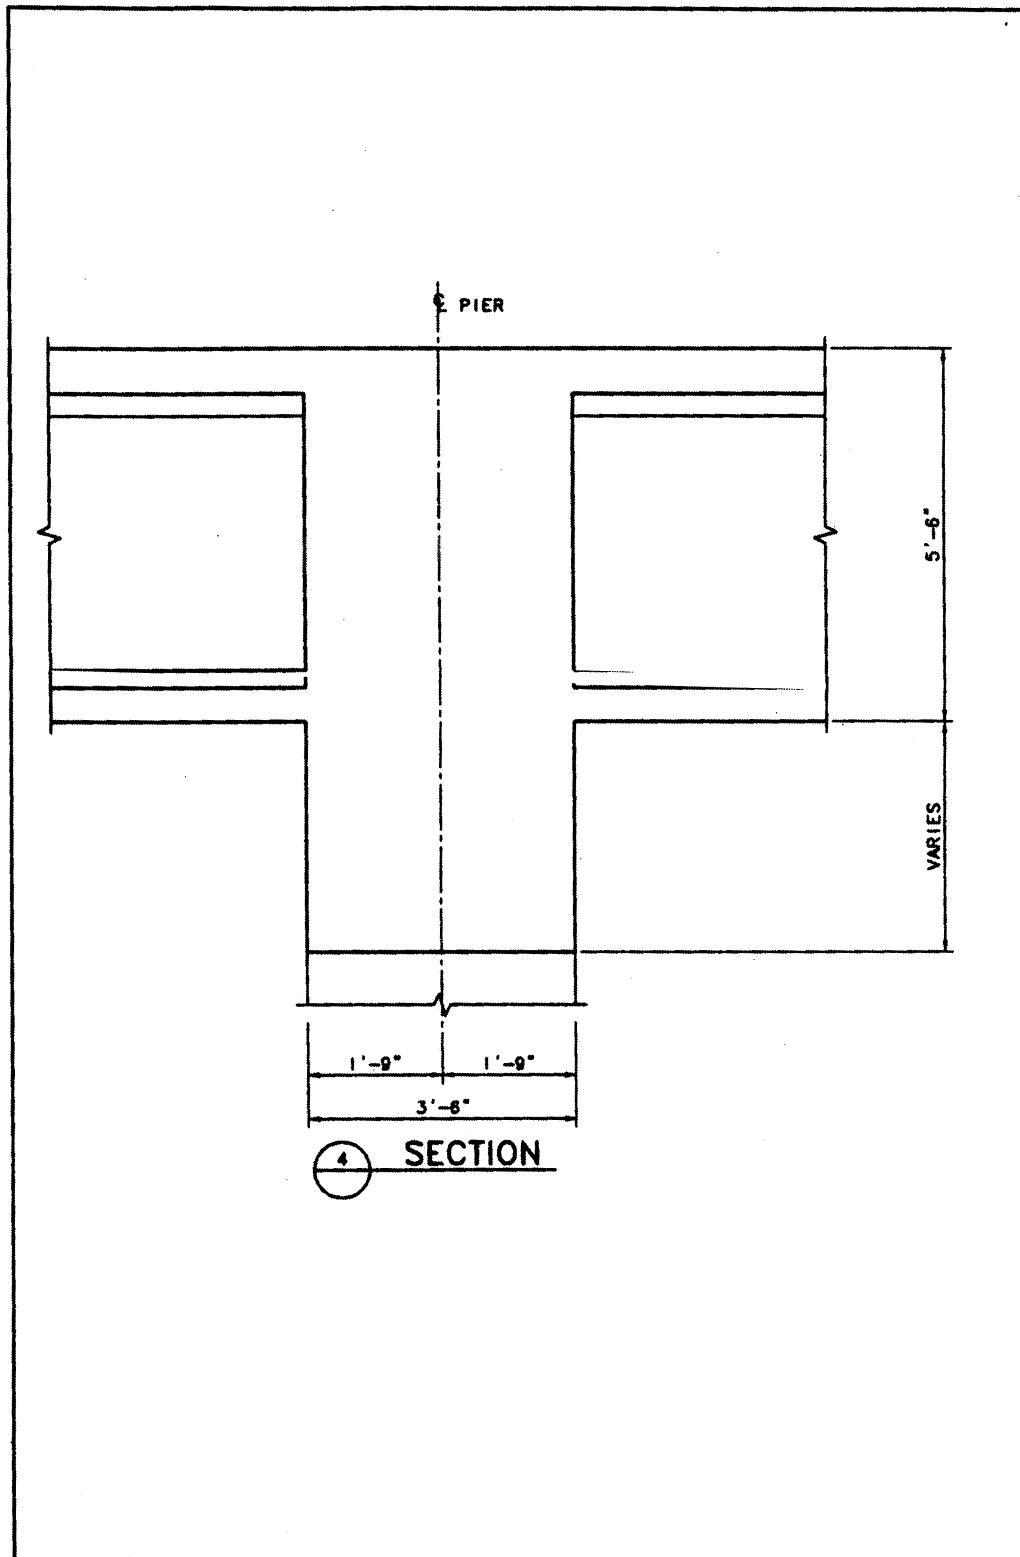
Bridge No. 6 – Section Through Integral Cap Beam
